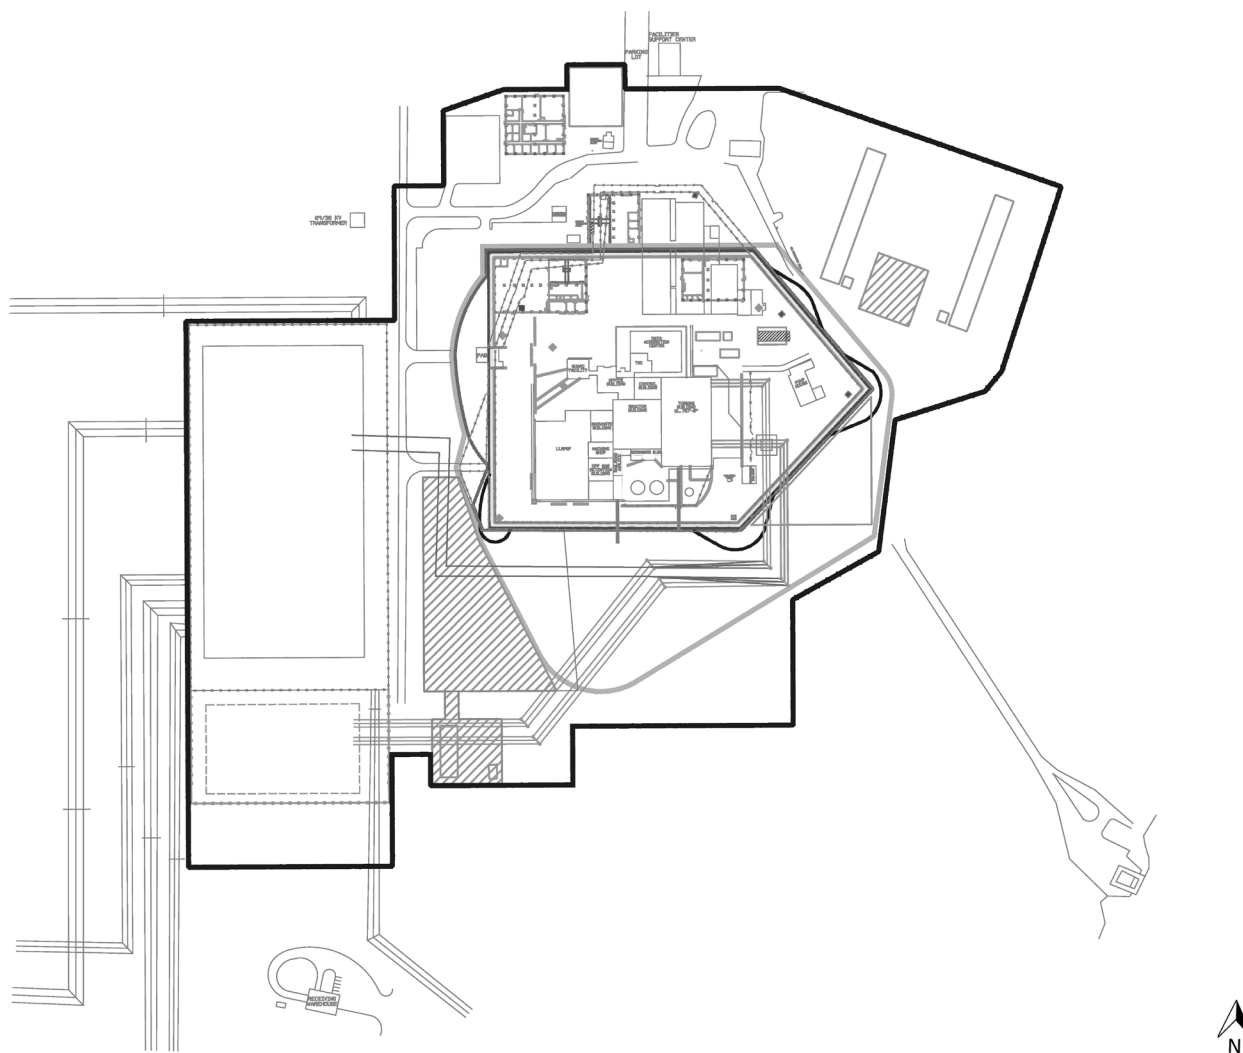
Proposed DAEC Site Plan for Restart
